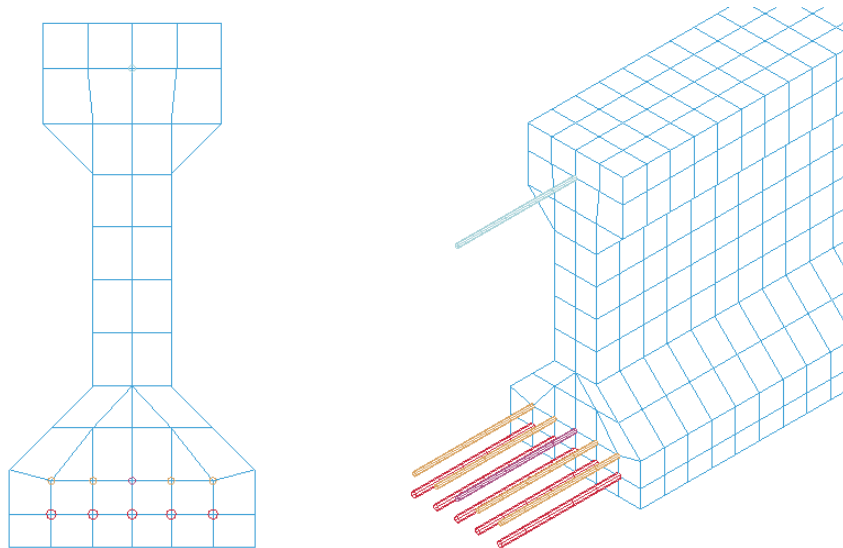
Zoom-In View of Strands at the Mid-Span of The Girder of Archetype 3 Bridge
